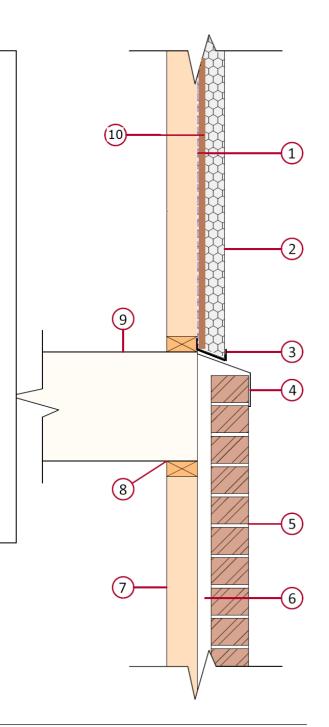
B- PANEL TO MASONARY DETAILS - SECTION VIEW - Cavity System
